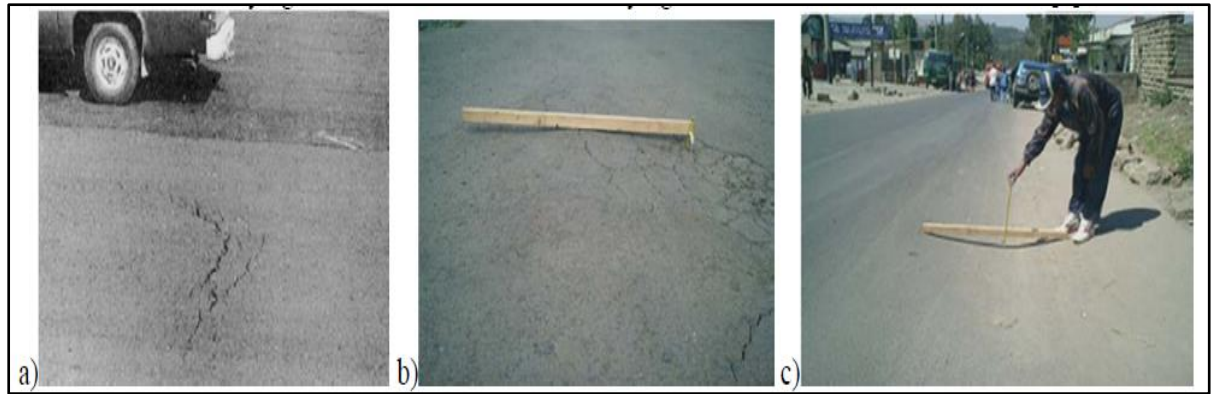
(a) Slippage cracks, (b) Swelling-upward displacement of a pavement, (c) Sag in asphalt pavement
